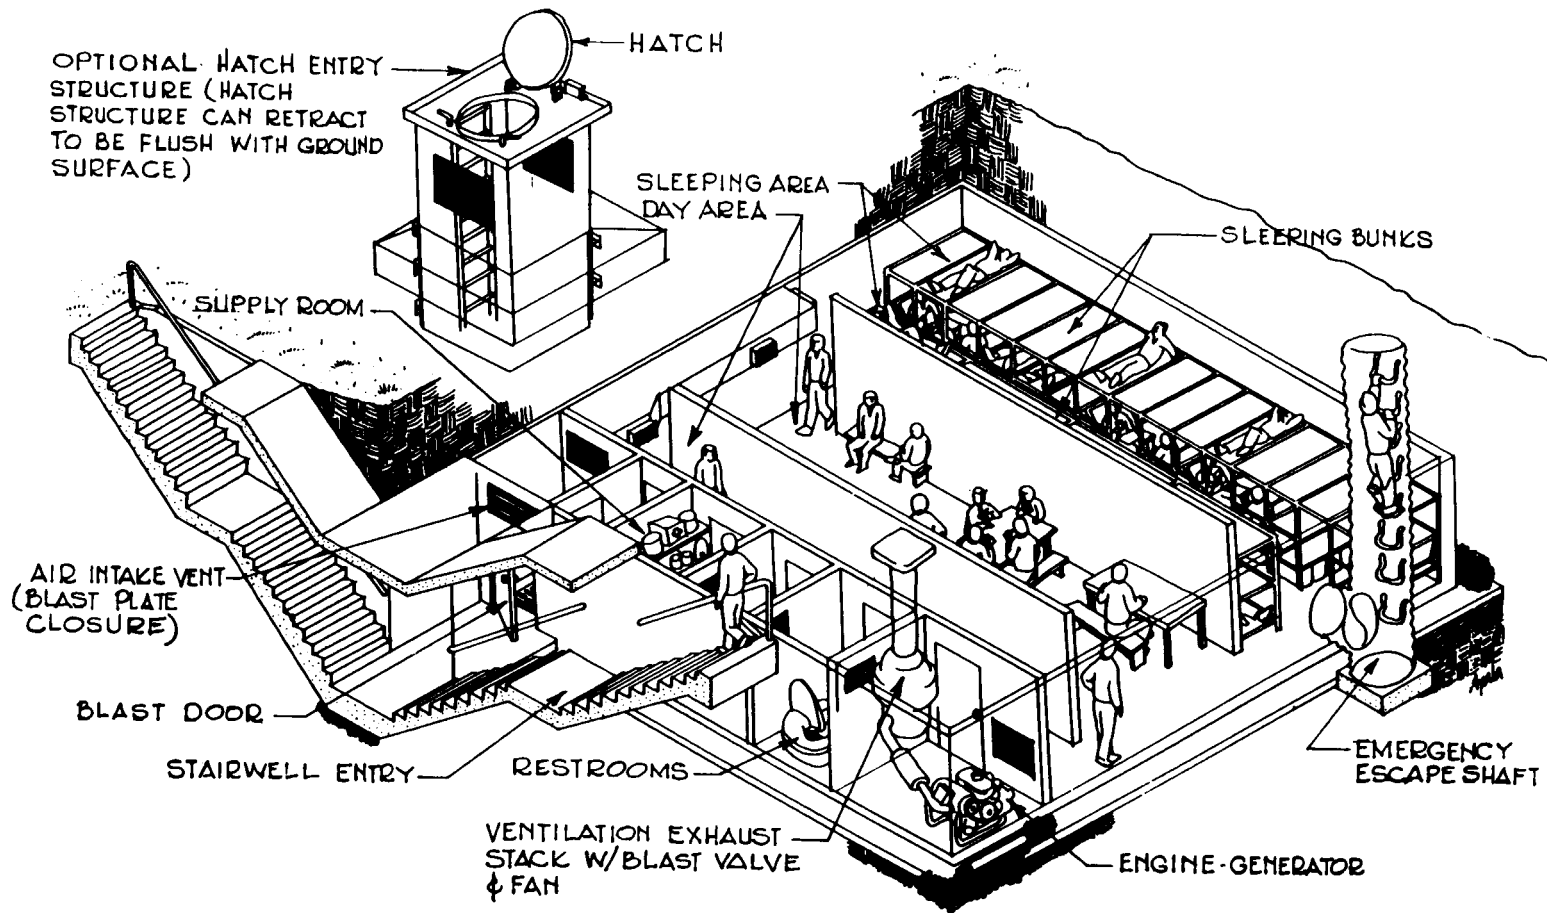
Belowground, reinforced concrete blast shelter for key workers.
